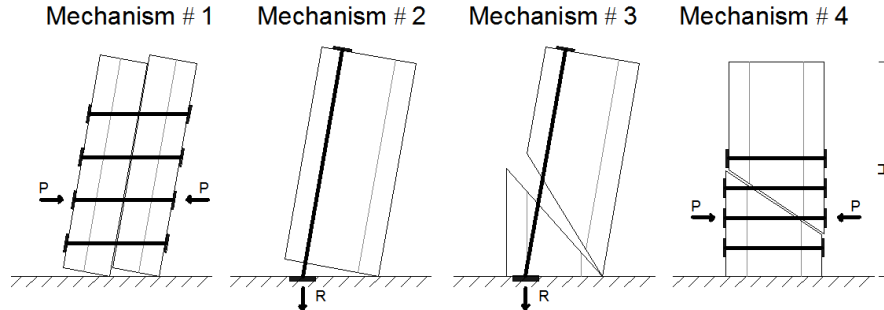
Conceptual retrofitting possibilities for different failure mechanisms of masonry towers.
